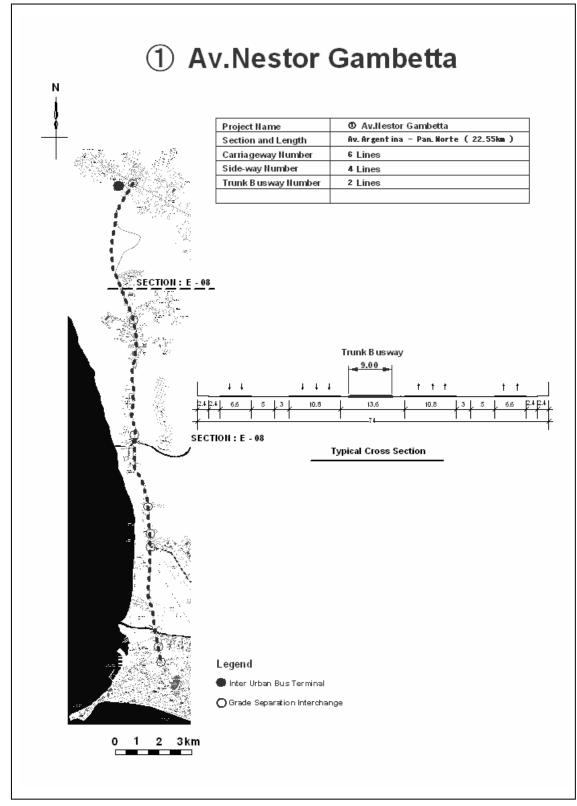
Trunk Busway Av. Nestor Gambetta
